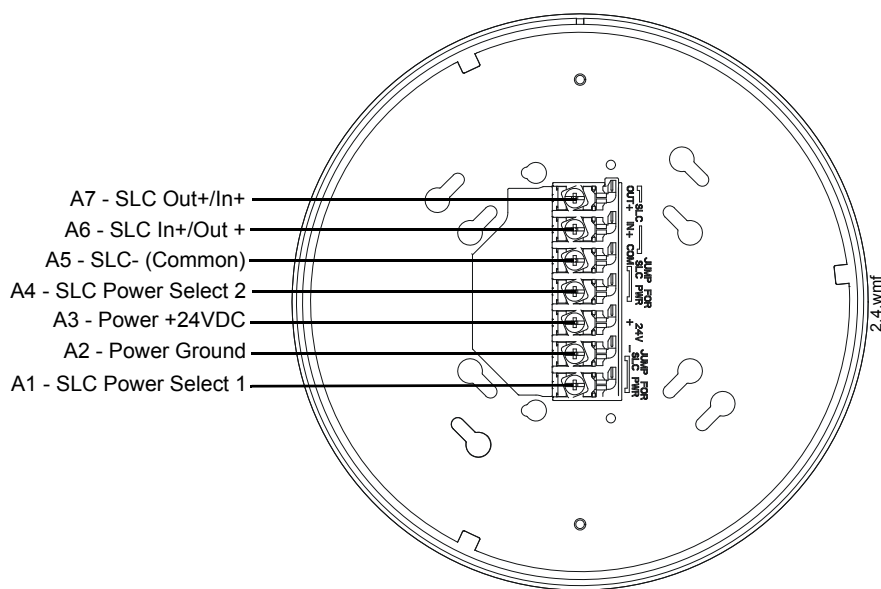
W-GATE Mounting Plate - Terminal Layout
